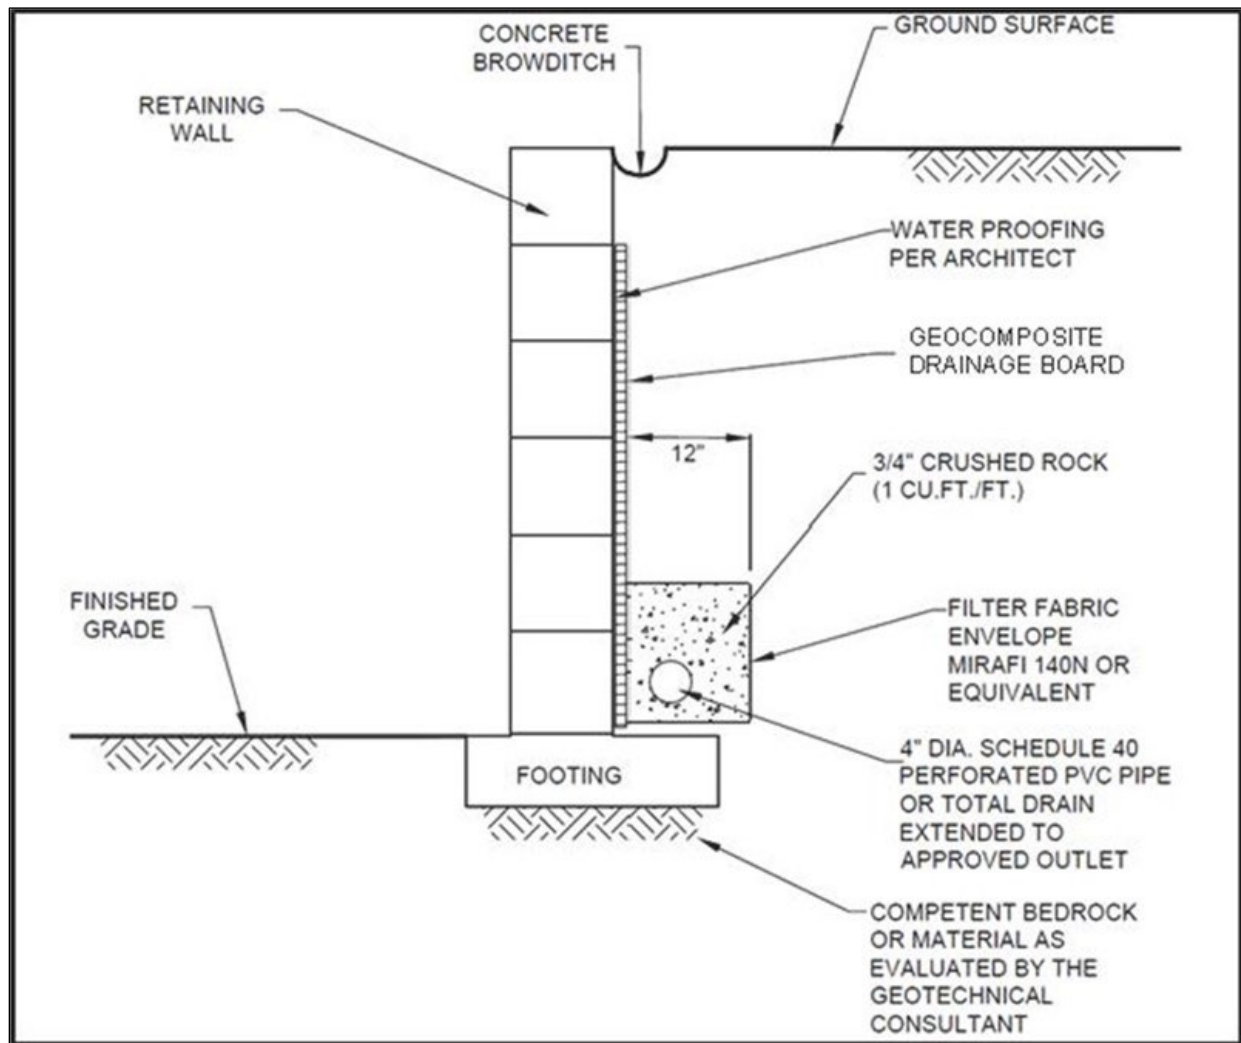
Typical Conventional Retaining Wall Backdrain Detail
